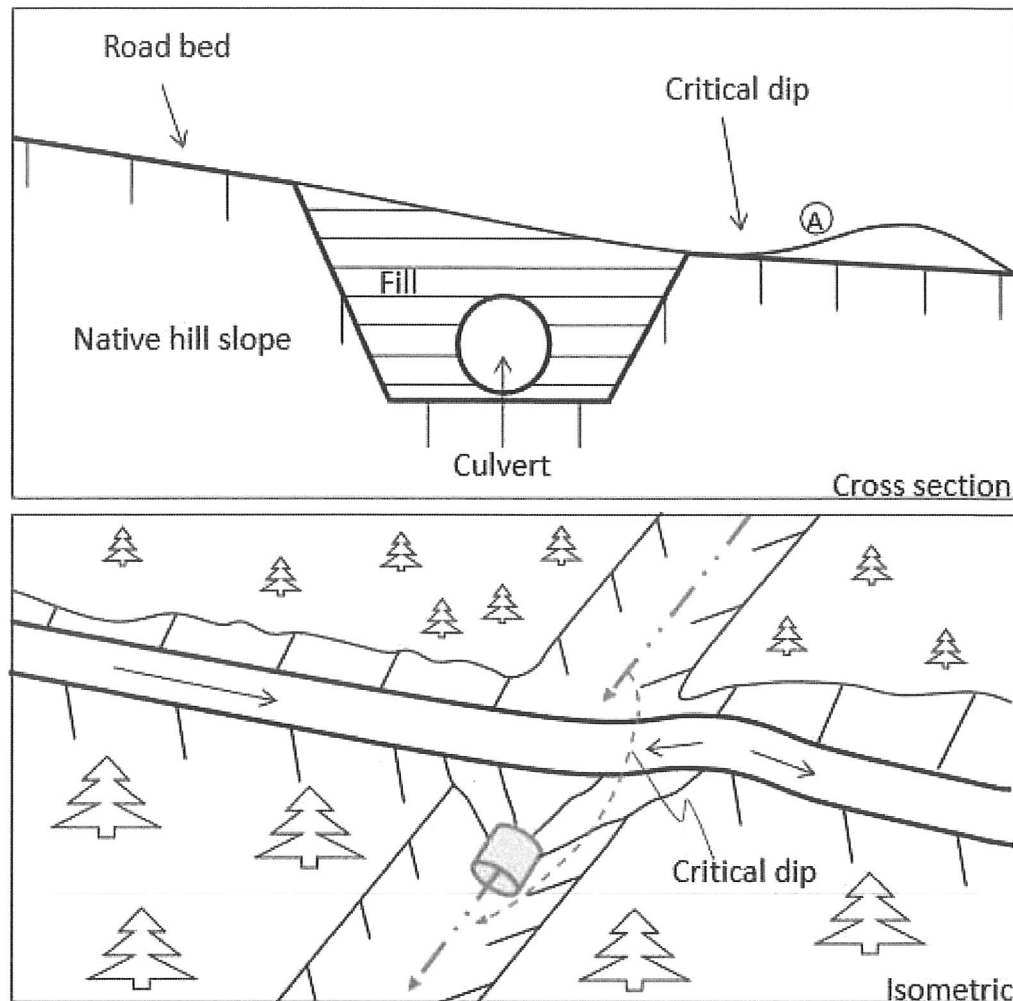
Critical dips or dipped crossing fills should be centered near a stream crossing's down-road hingeline, not over the centerline of the crossing where overtopping could cause washout or severe erosion of the fill. If the stream crossing culvert (B) plugs, water will pond behind the fill until reaching the critical dip or low point in the crossing (C) and flowing back down into the natural stream channel. The down-road ditch must be plugged to prevent streamflow from diverting down the ditch line. For extra protection in this sketch, riprap armor has been placed at the critical dip outfall and extending downslope to the stream channel. This is only required or suggested on stream crossings where the culvert is highly likely to plug and the crossing fill overtopped. The dip at the hinge line is usually sufficient to limit erosional damage during an overtopping event. Road surface and ditch runoff is disconnected from the stream crossing by installing a rolling dip and ditch relief culvert just up-road from the crossing (A) (Keller and Sherar, 2003).
